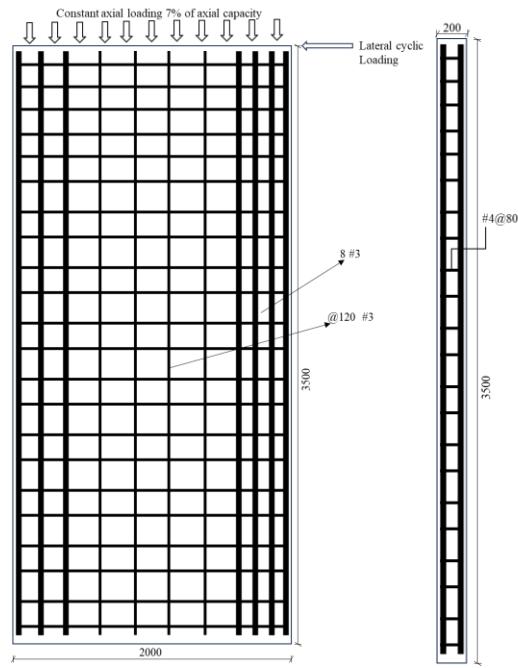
G-15 concrete dimensions and details of reinforcement configuration
